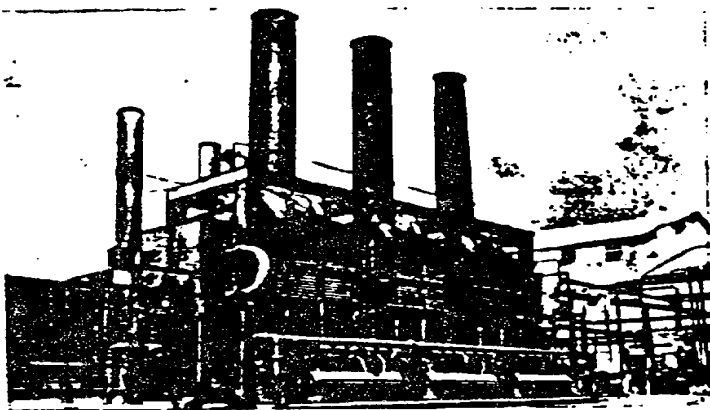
This ON SH. Constructed of INSULAG Panels in Upper Section, with INSULBRICK, INSULAG and INSULCRETE in Lower Section, Has Not Had a Hot Spot.
